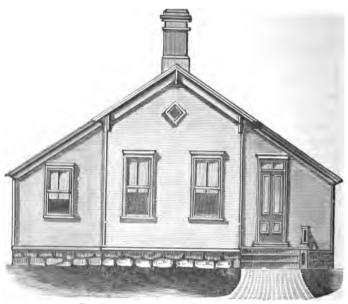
ELEVATION OF FRONT OF HOUSE.
